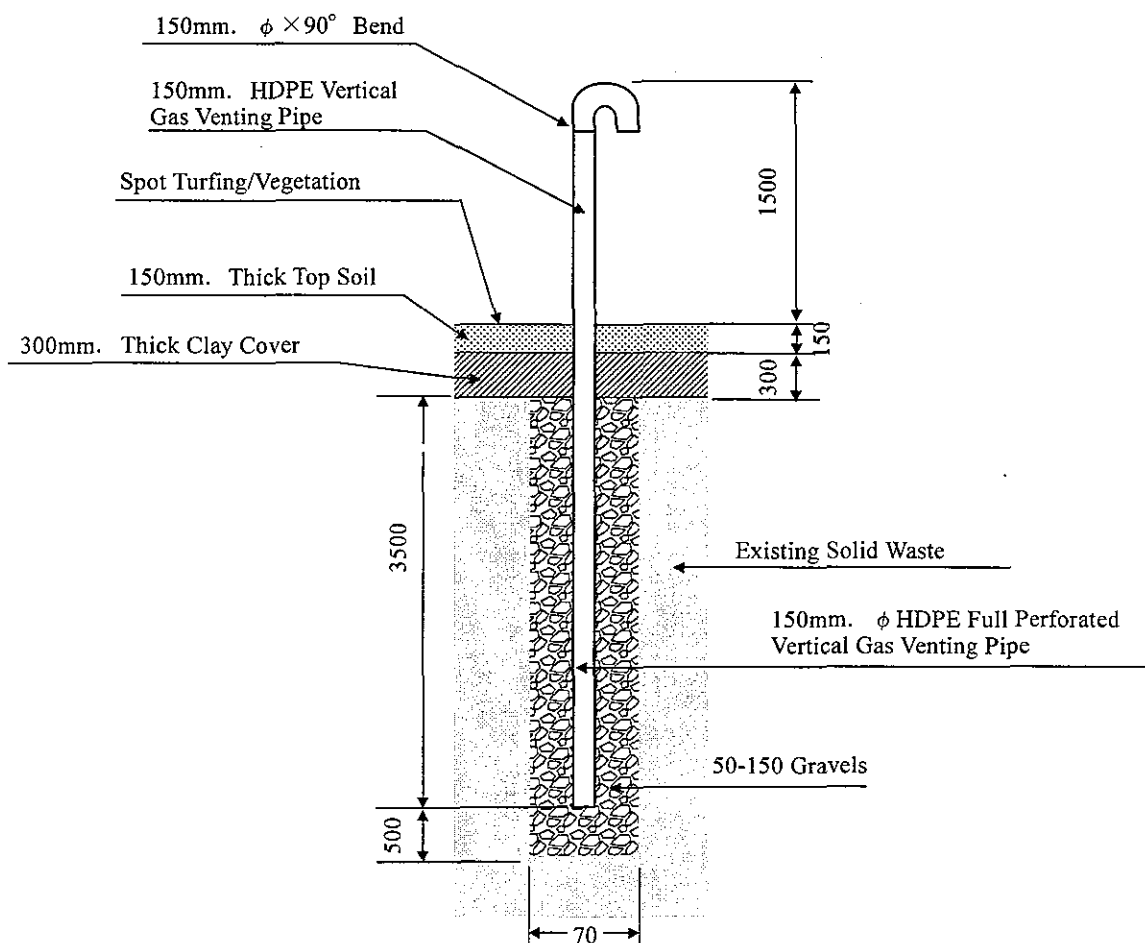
Typical 150mm. ϕ Vertical Gas Venting Pipe Detail
